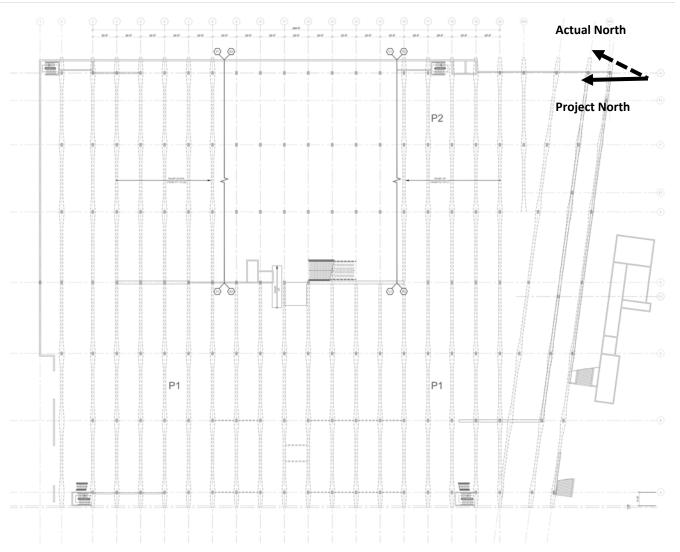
Partial Upper Pier and Lower Village Levels, South Pier Parking Structure
